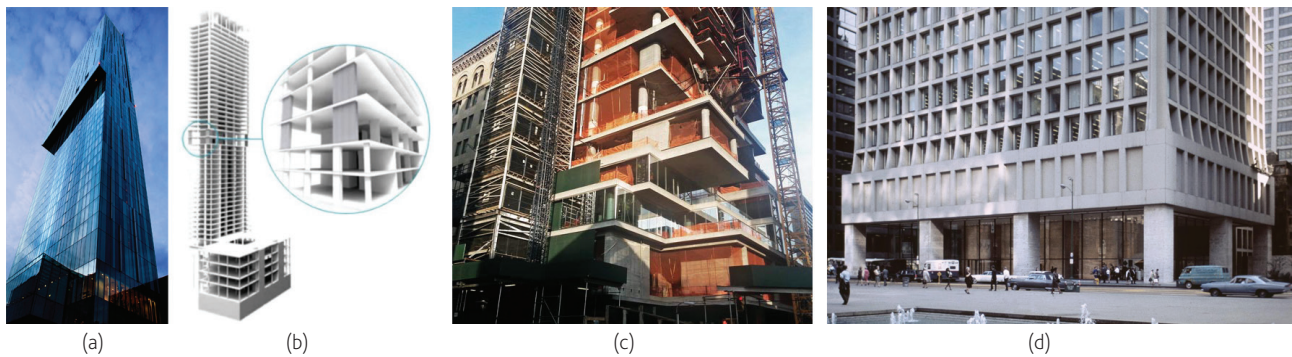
(a) Beetham Tower, Manchester, UK; (b) Walking column system at the Beetham Tower; (c) Walking column at the 56 Leonard, Manhattan, New York, USA; (d) Deep beam in the Brunswick Building, Chicago, USA
